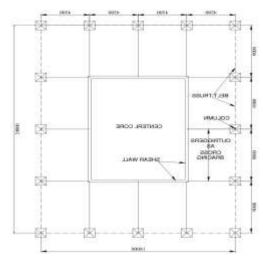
Plan of rectangular geometry with outrigger belt truss system for zone III
